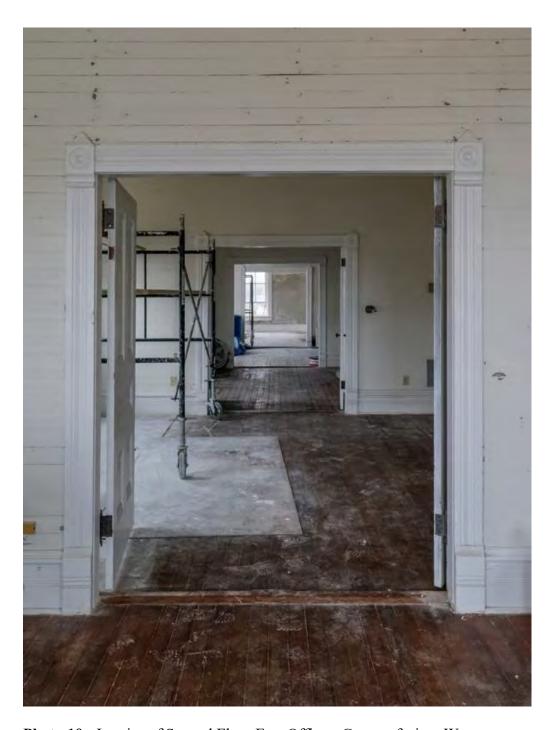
Interior of Second Floor East Offices. Camera facing: West
